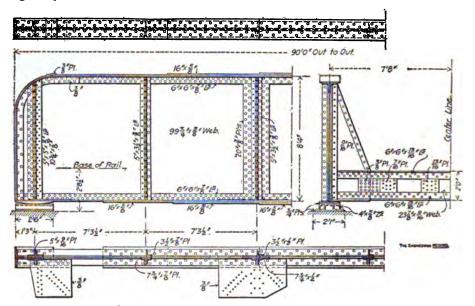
RAILWAY THROUGH PLATE GIRDER BRIDGE.
